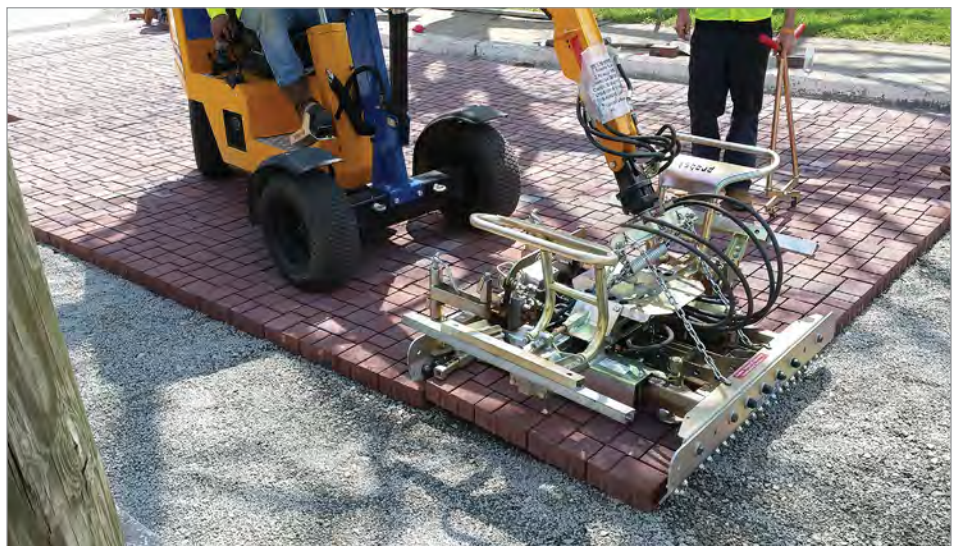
Machine-installed concrete pavers place them in their final laying pattern.
